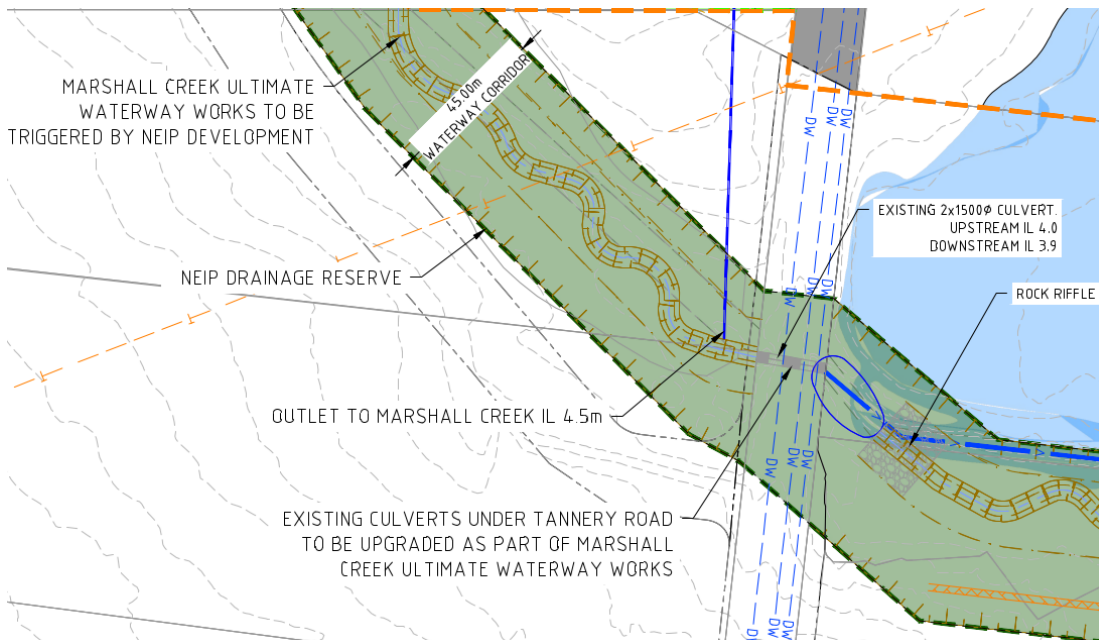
Concept design of Tannery Road reach, showing existing culverts crossing under Tannery Road (From Spiire concept design plans Appendix 3 of SWMS)
